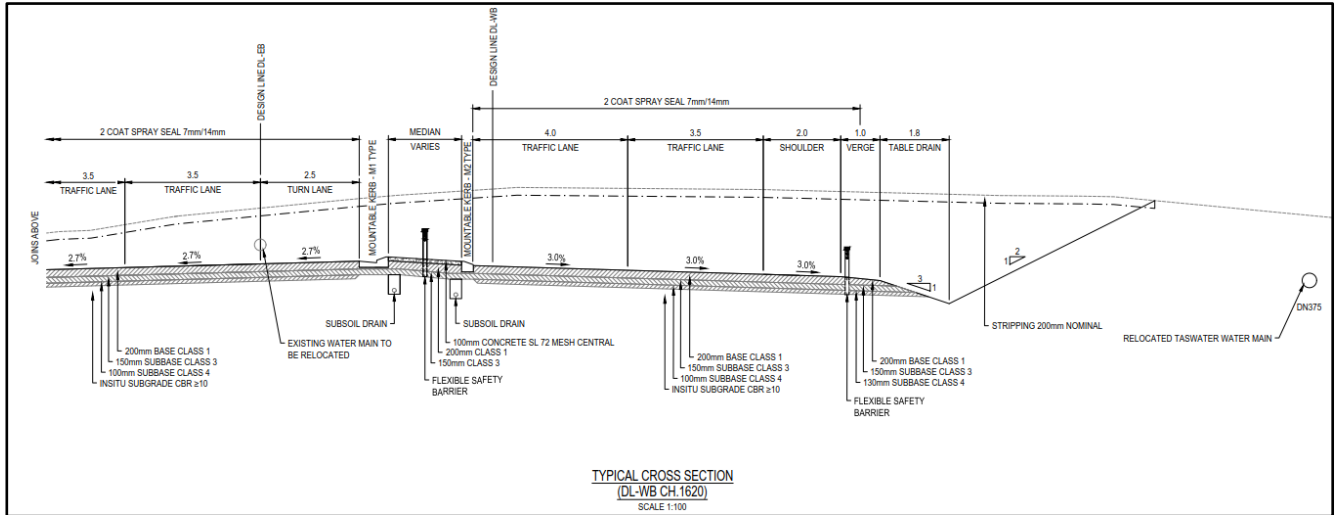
Typical cross section showing maximum depth of 2.8 metres
